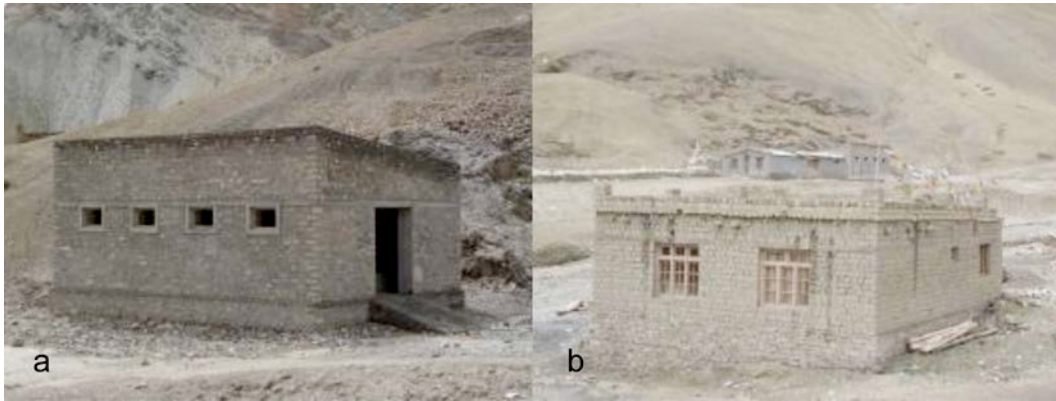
Kanji, Ladakh: (a) a rice store built of stone, cement and concrete; (b) a new earthen house with a concrete curb (credits: Désirée De Antoni, 2010)
